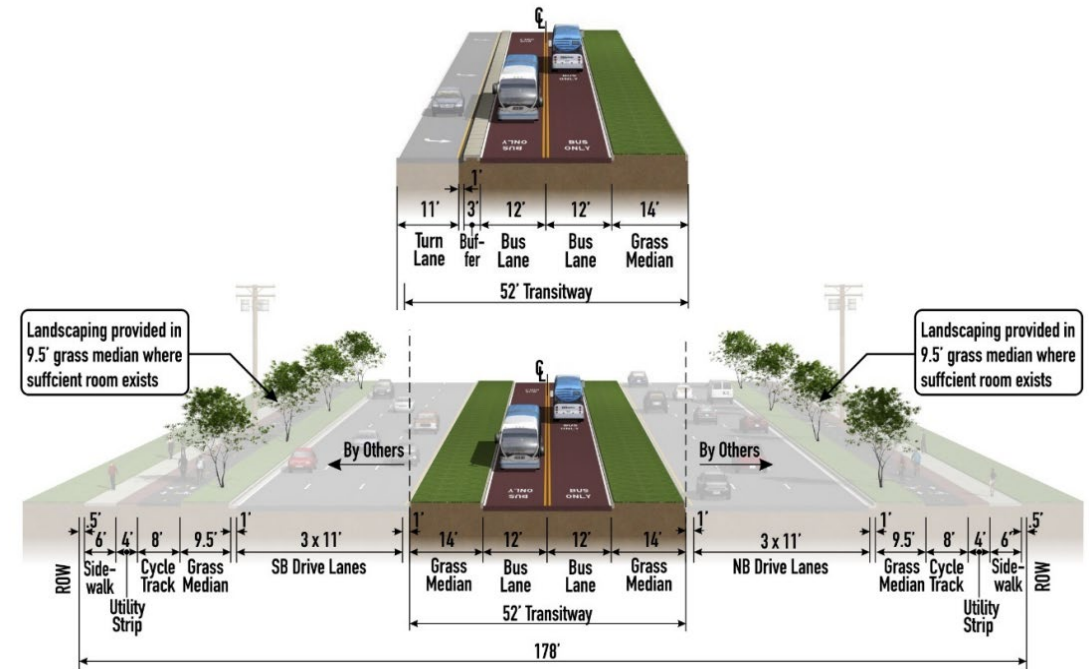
Typical Section – Richmond Highway from Sherwood Hall Lane to Jeff Todd Way
